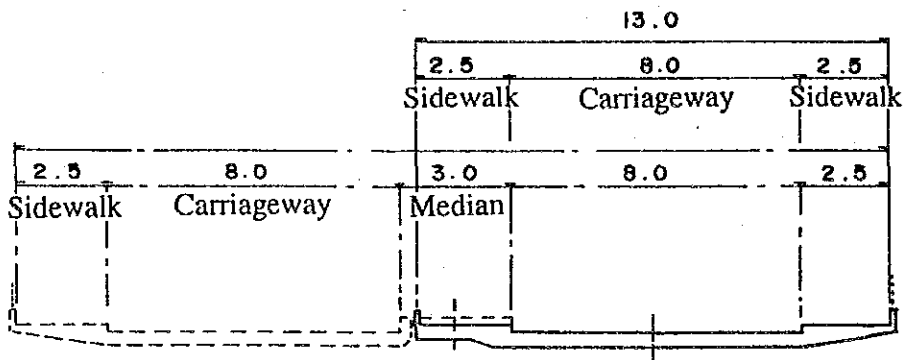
Typical Cross-Section of South Link of Inner Ring Road 1/2
